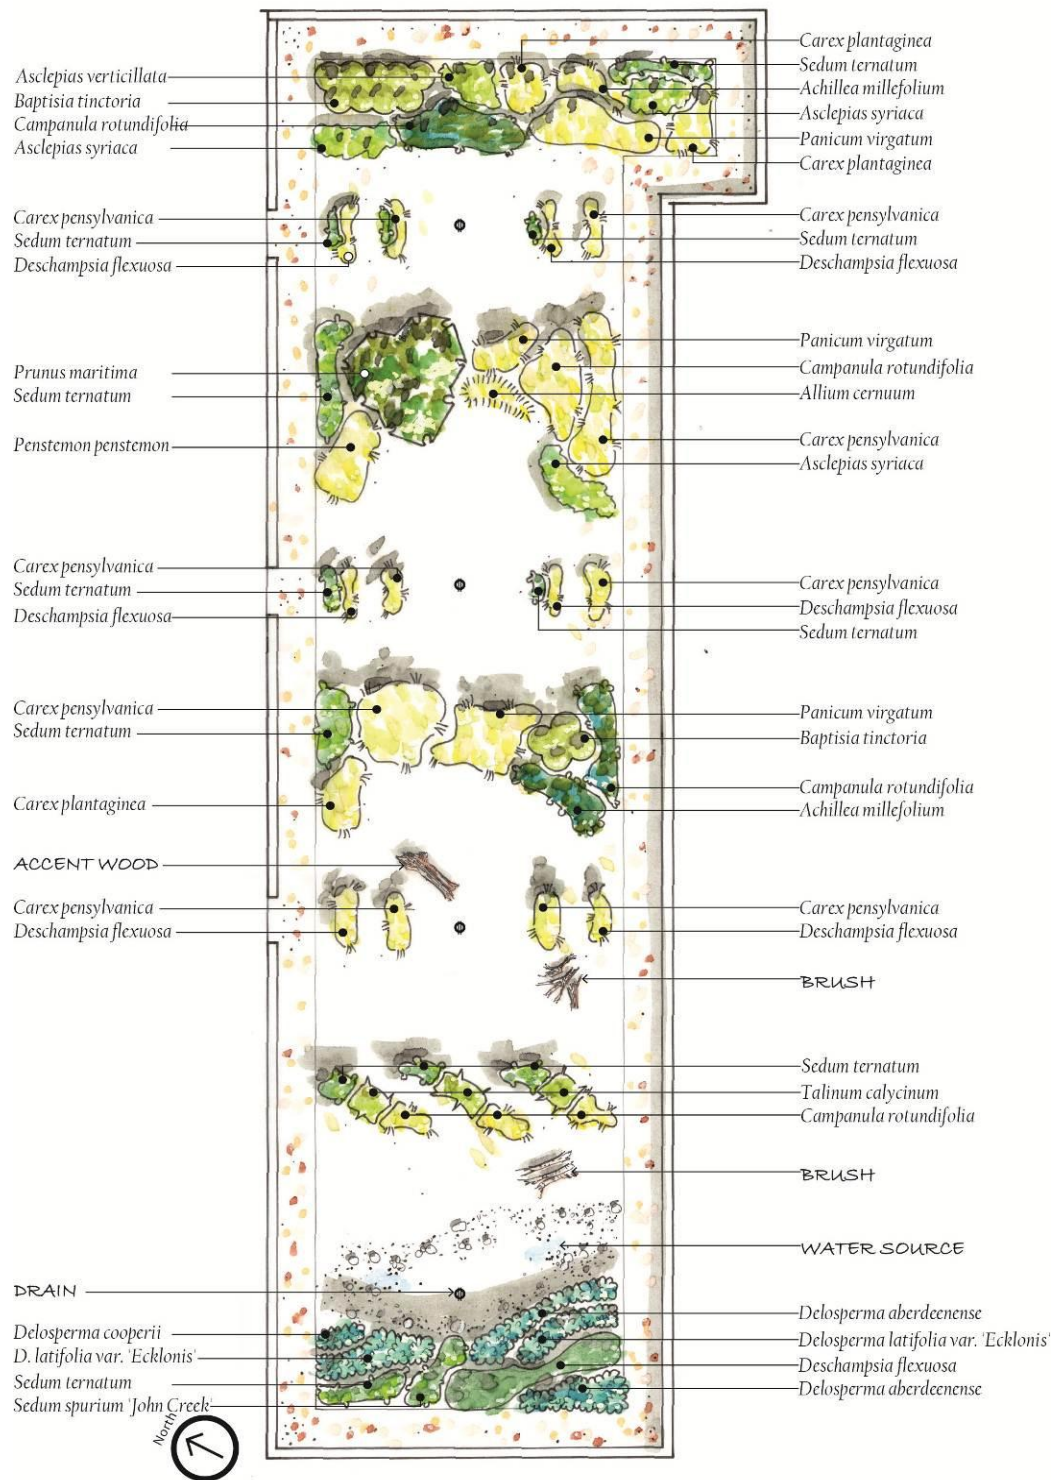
“Least Tern Roof Plan,” 6,000 square foot roof, designed with plants that bloom in June and July, illustrated by Author.
